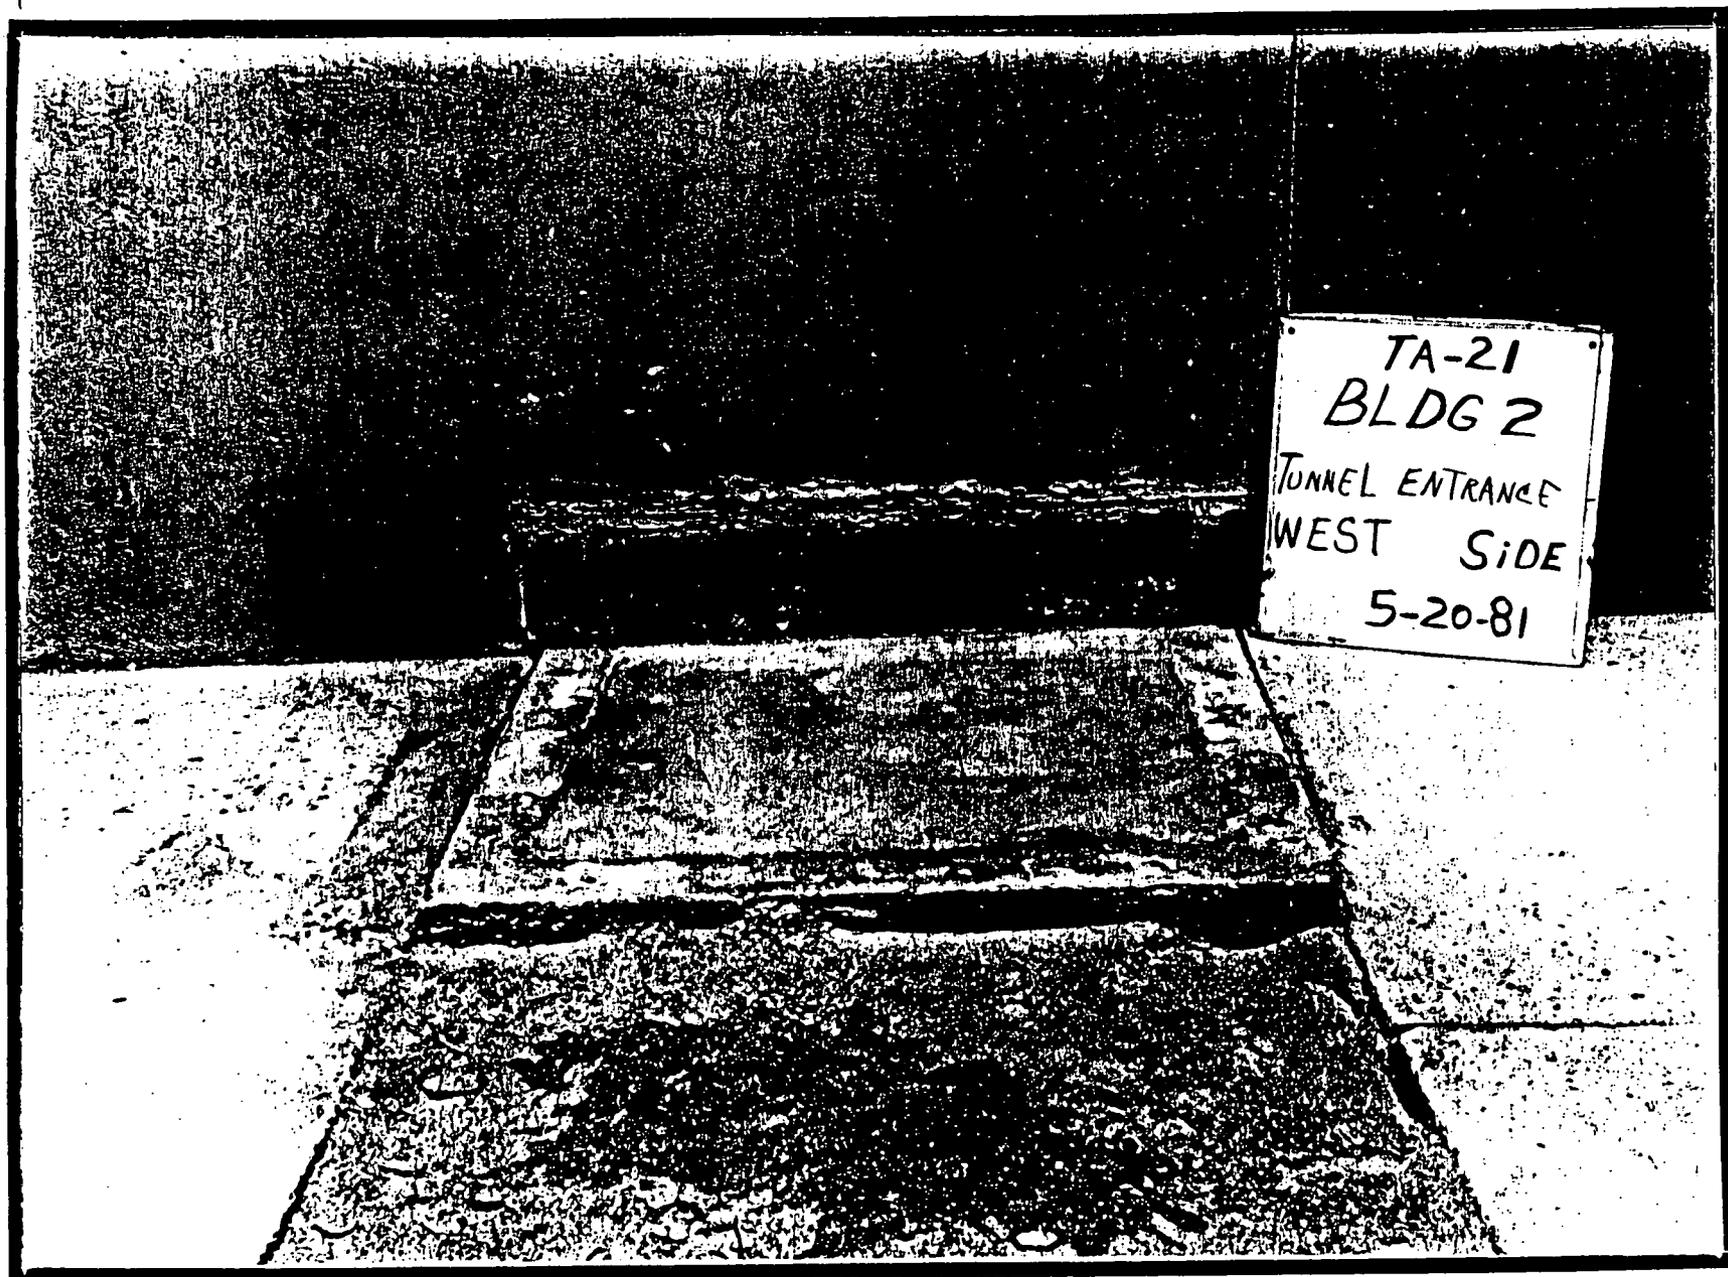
Cement cover, perimeter tunnel west side of building. NEG #813727
